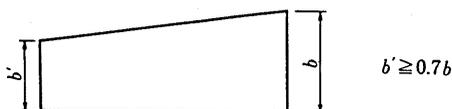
Diagonal cutting in a prestressed concrete panel
